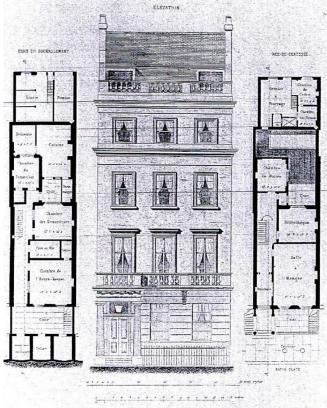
1855 plan and elevation of typical houses on Eaton Place by Cesar Daly. Note extensions to rear.
